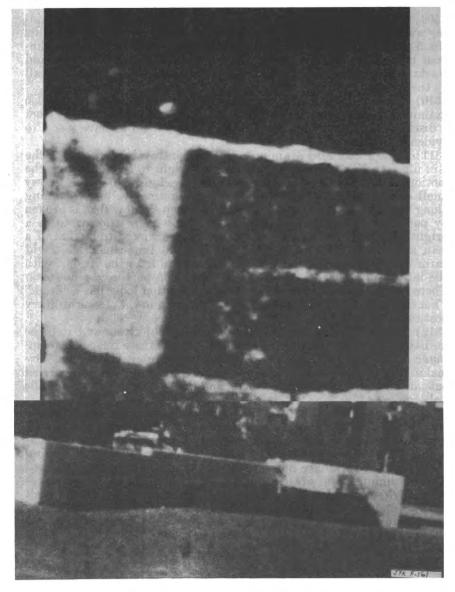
Retaining wall image (Nix film) Top: Enhanced. Bottom: Unenhanced.
